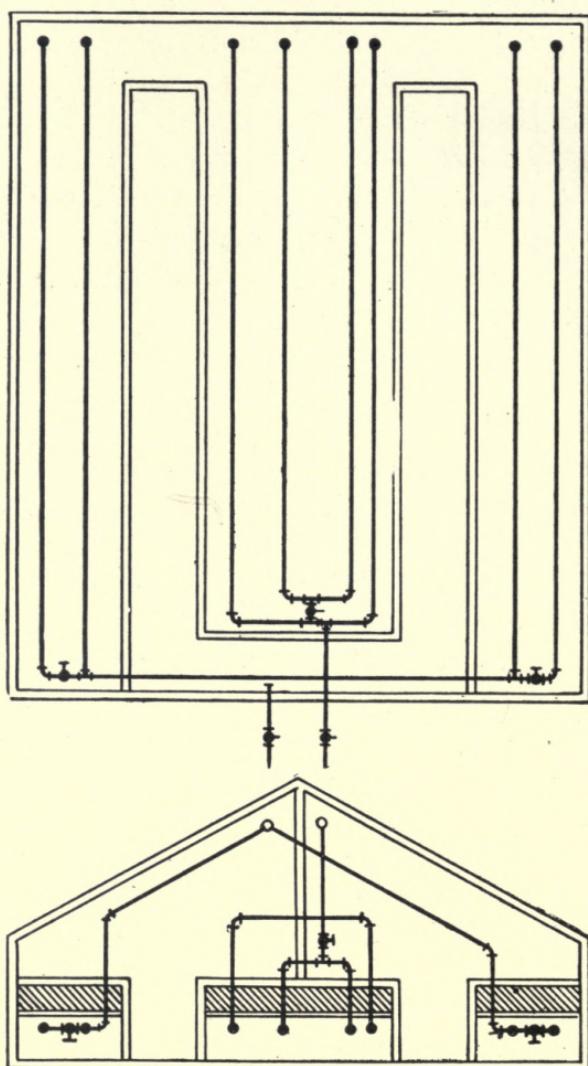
Plan and Elevation Showing One Method of Running Piping in a Greenhouse
